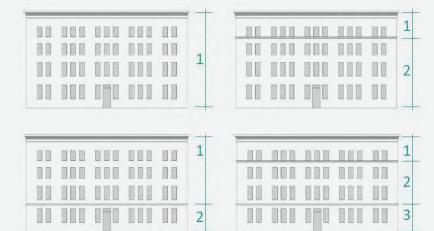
Façades divided into 1, 2, and 3 horizontal layers
